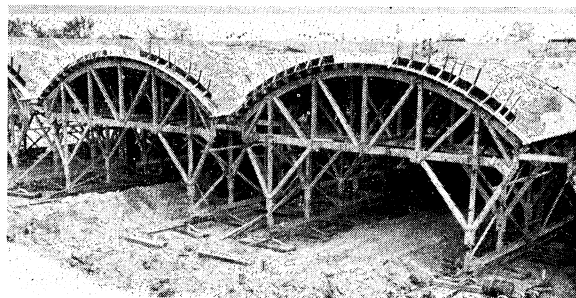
Centerings for 340-ft span U. S. Air Force hangars. Timber ring-connected trusses are supported on light braced towers consisting of 6-in. posts and 2 x 6-in. diagonals. Screw jacks are located both at rail level and at bottom chord of trusses. Note arrangement for lifting concrete by cranes
